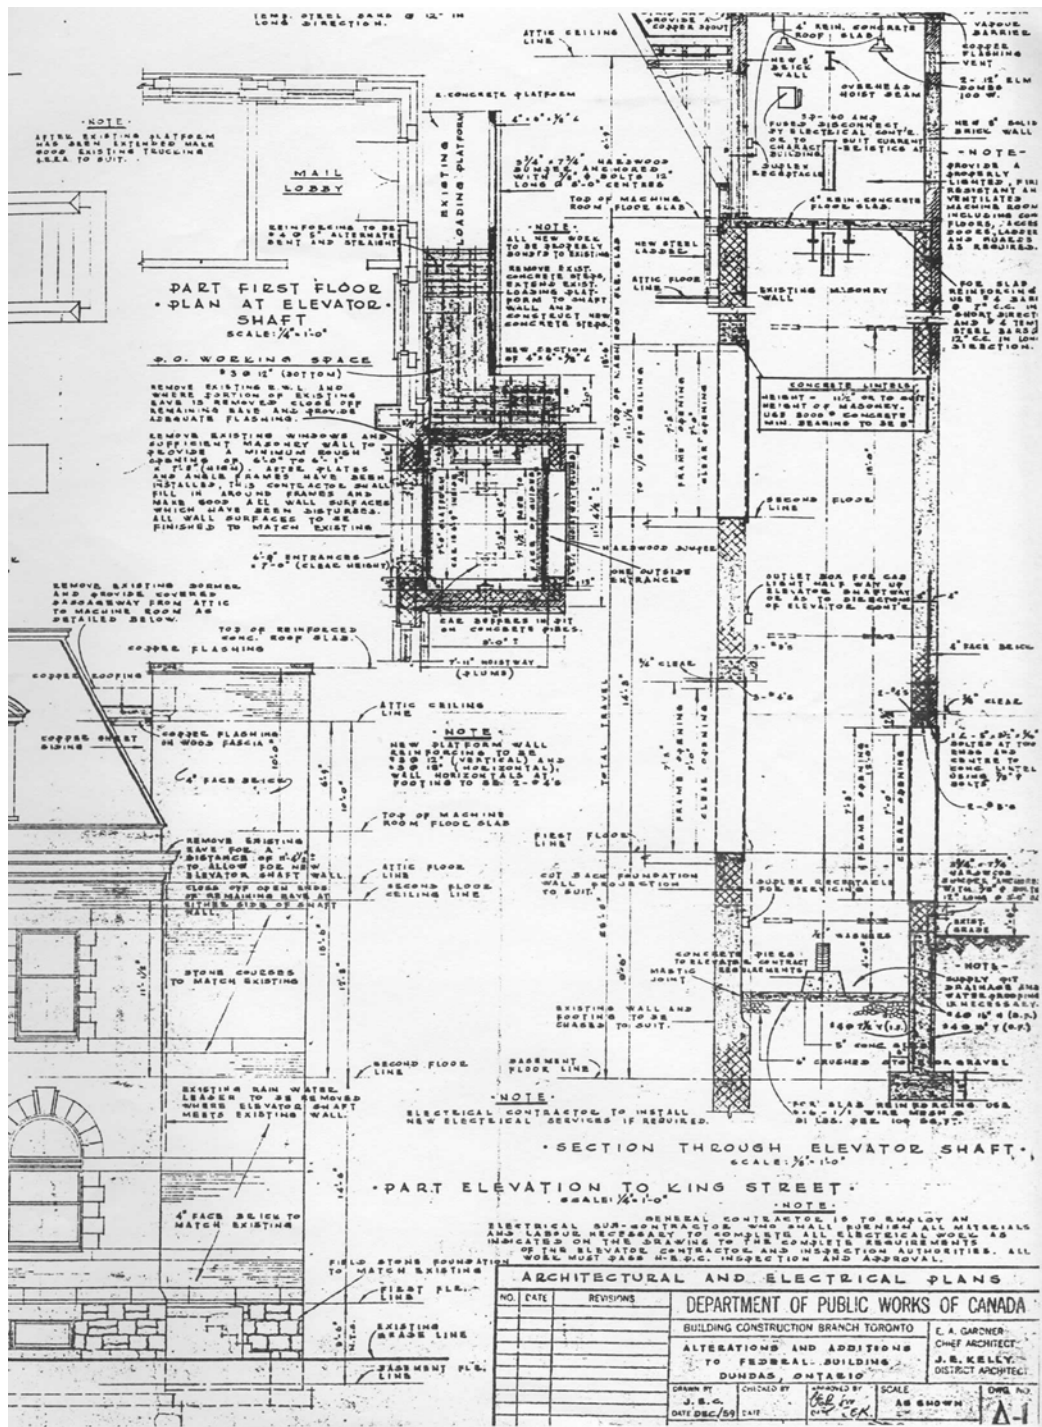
Section of the 1959 composite drawing showing a north elevation and section of the new elevator shaft to be added to the west facade. Also shown in plan form are alterations to be made to the loading platform due to the elevator addition.
